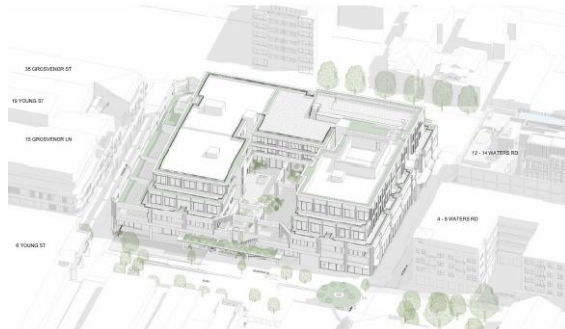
Revised 3D Modelling from the south (Source: SJB Architects)
